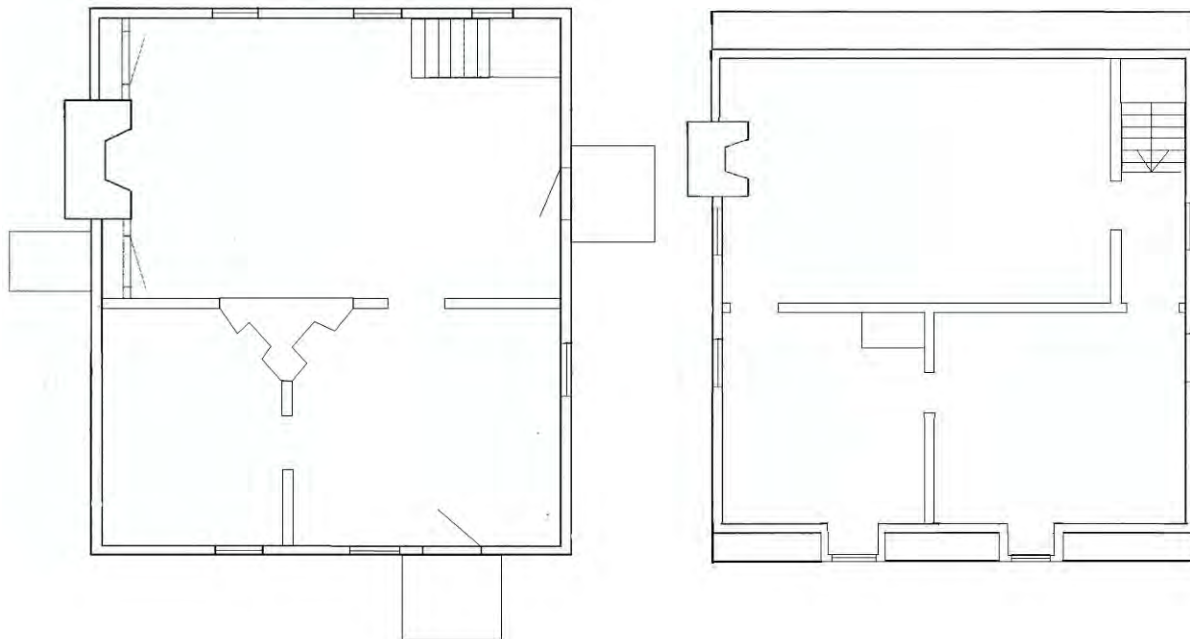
Conjectured layout during Gregory ownership, first floor (Left) and second floor (Right).
